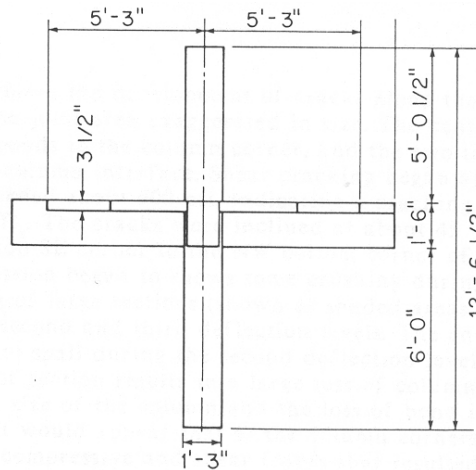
Specimens details, Leon and Jirsa (1986)
